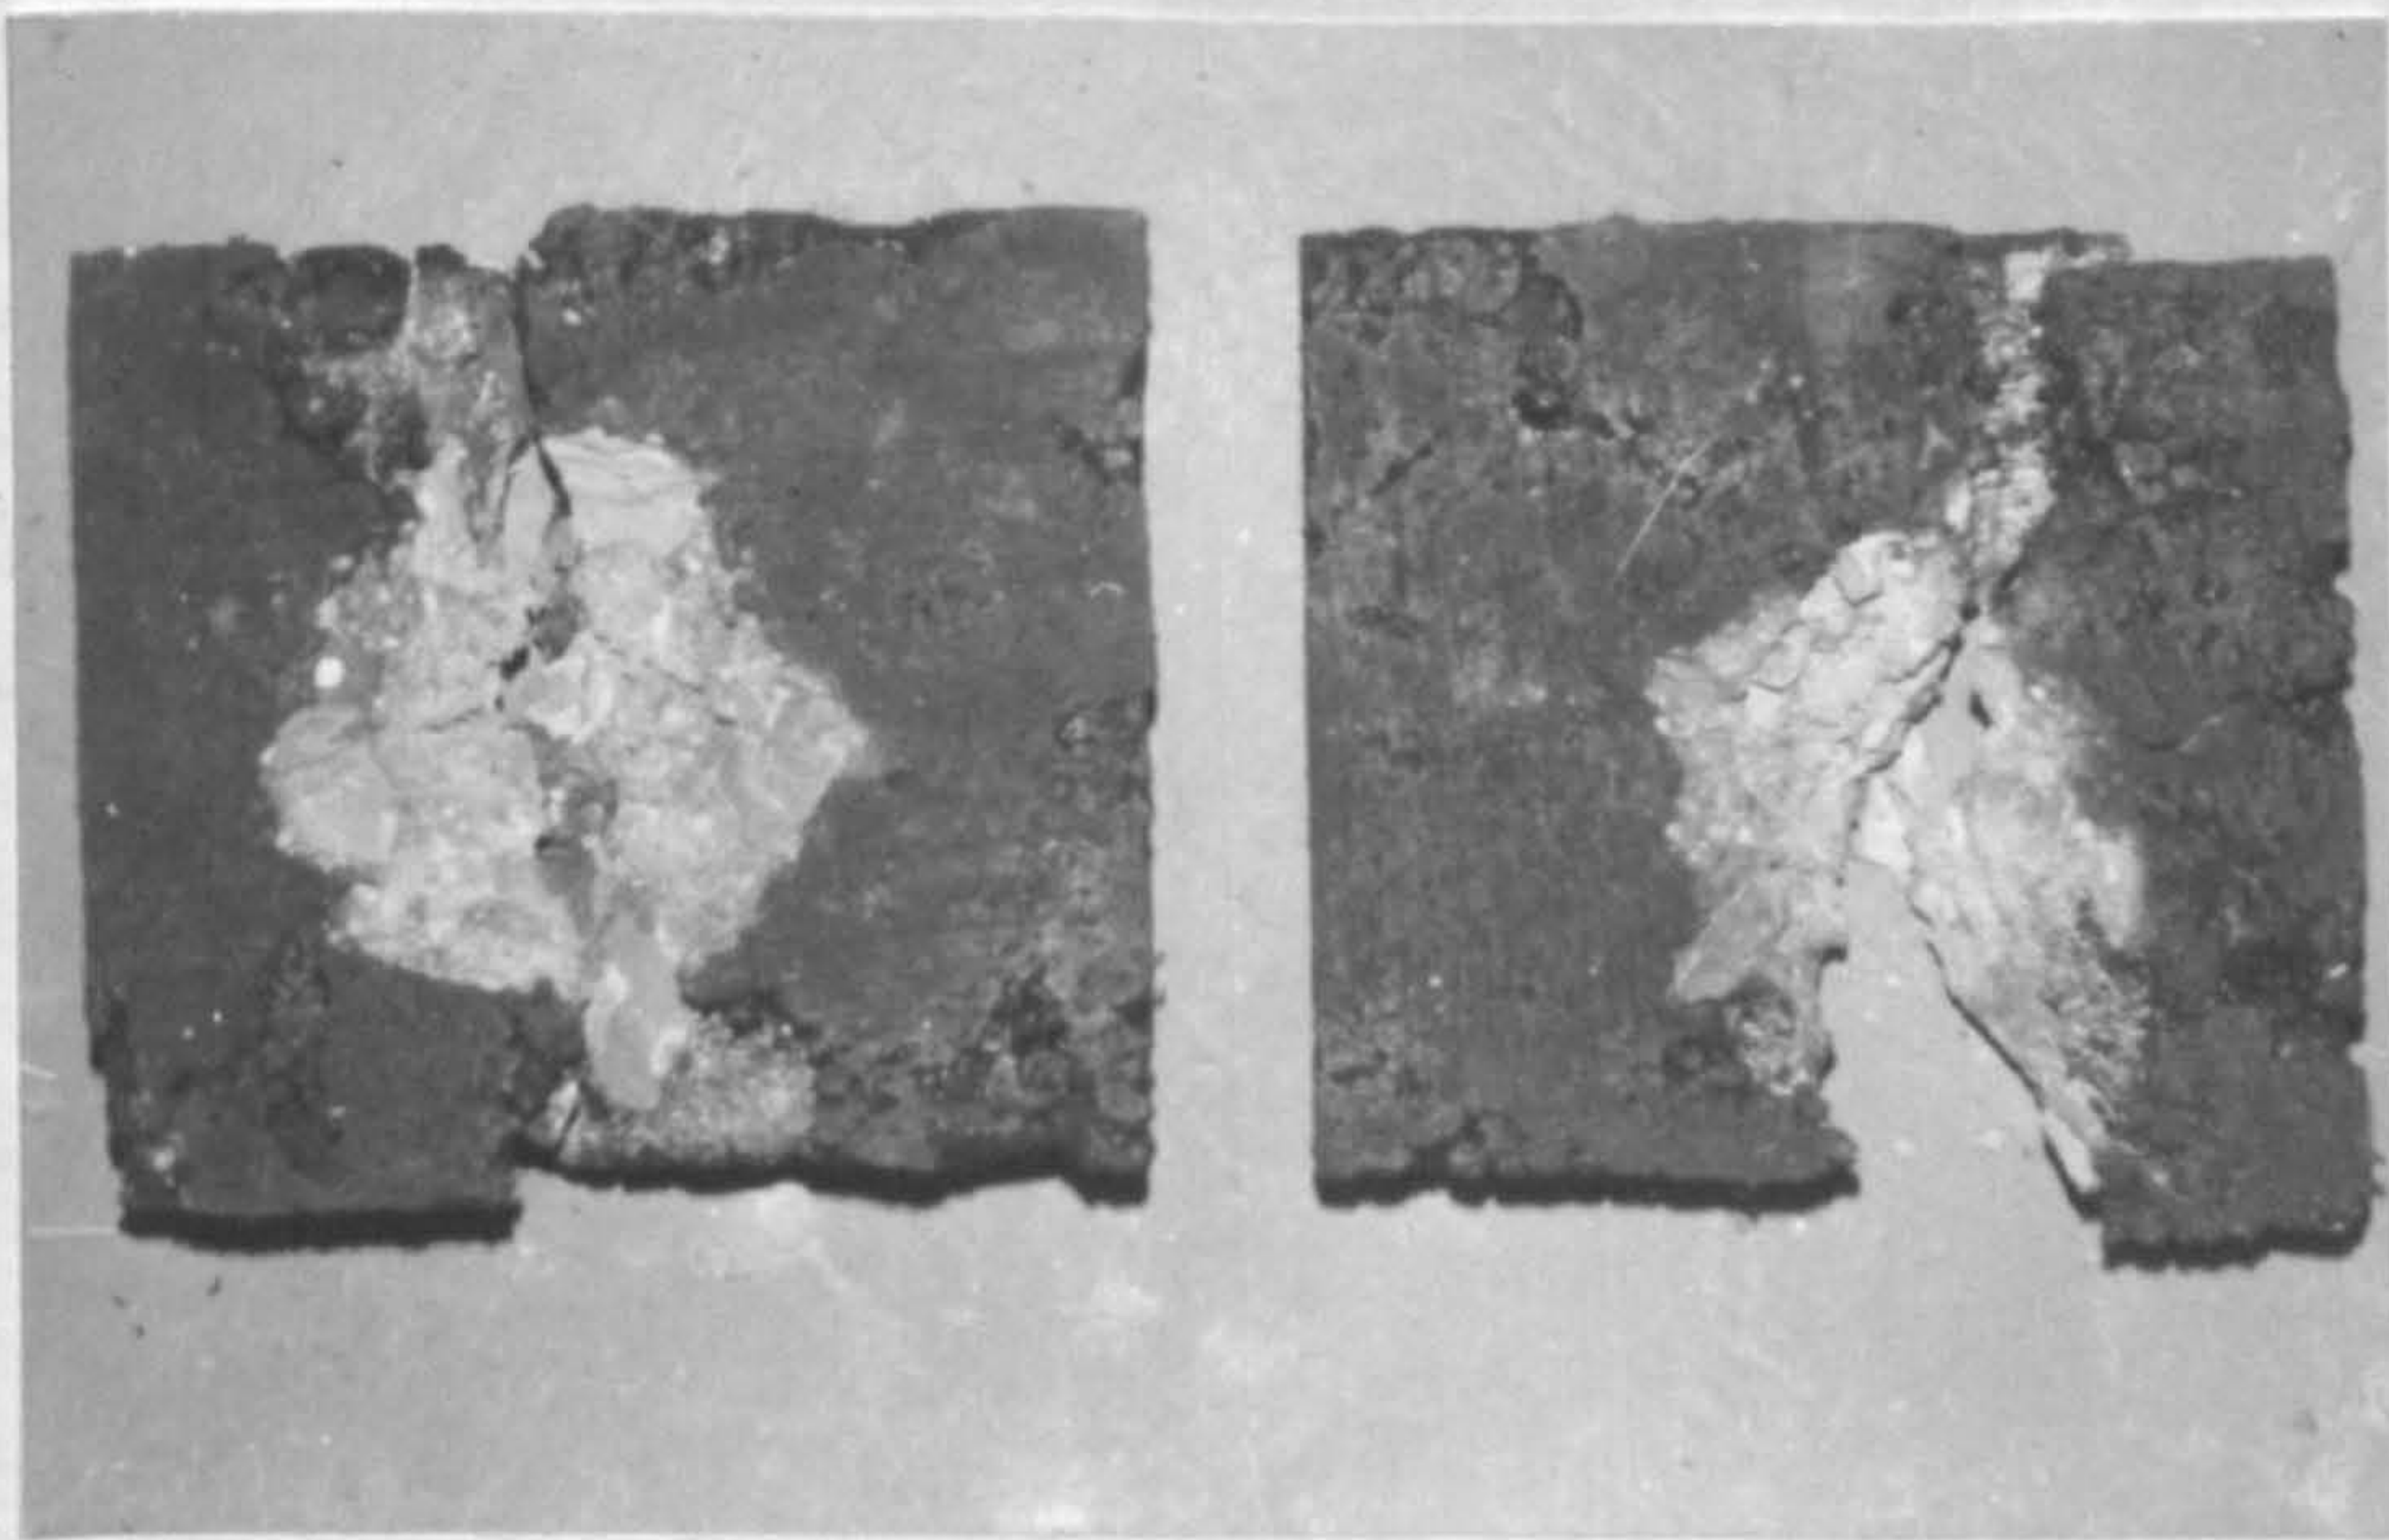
TYPICAL IMPACT FACE DAMAGE, SERIES 18
